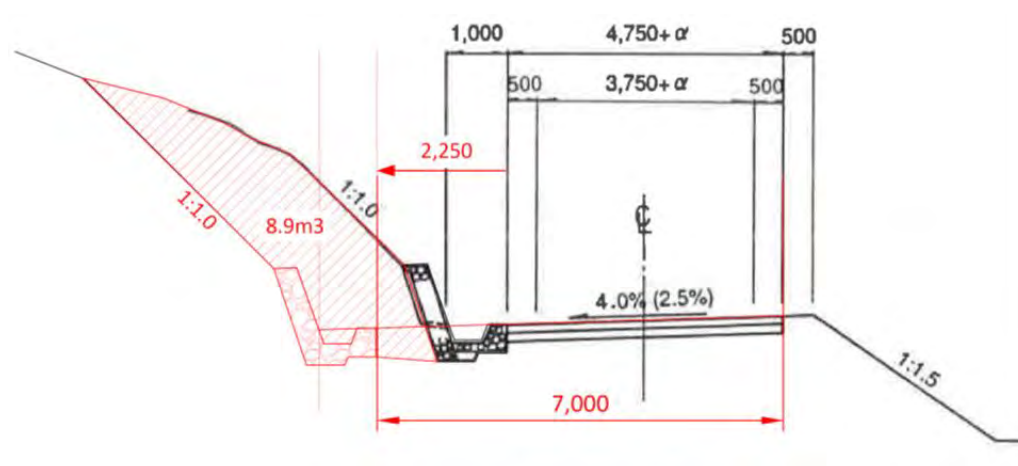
27 Typical Image of Soil Excavation on the Mountain Side
